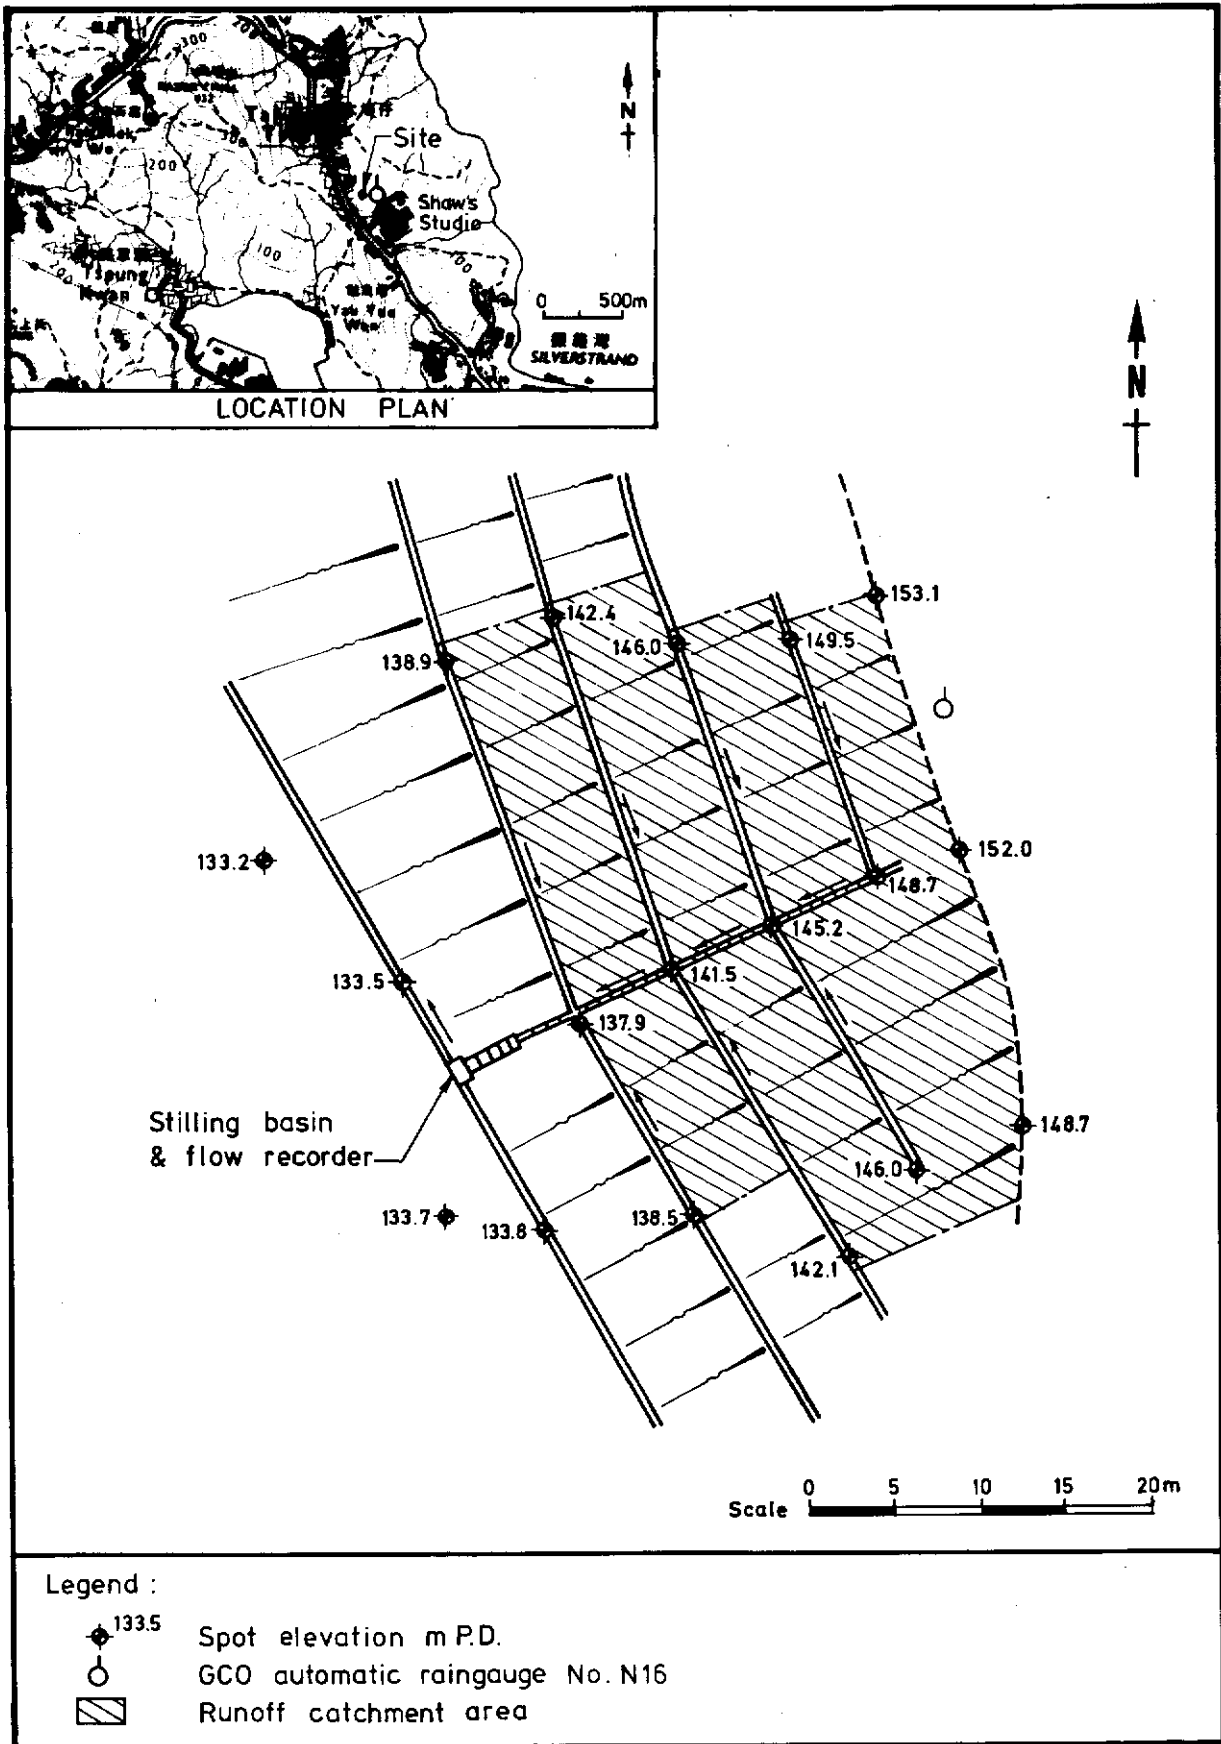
Site Plan for the Runoff Plot at Kohima Barracks (KOH)
